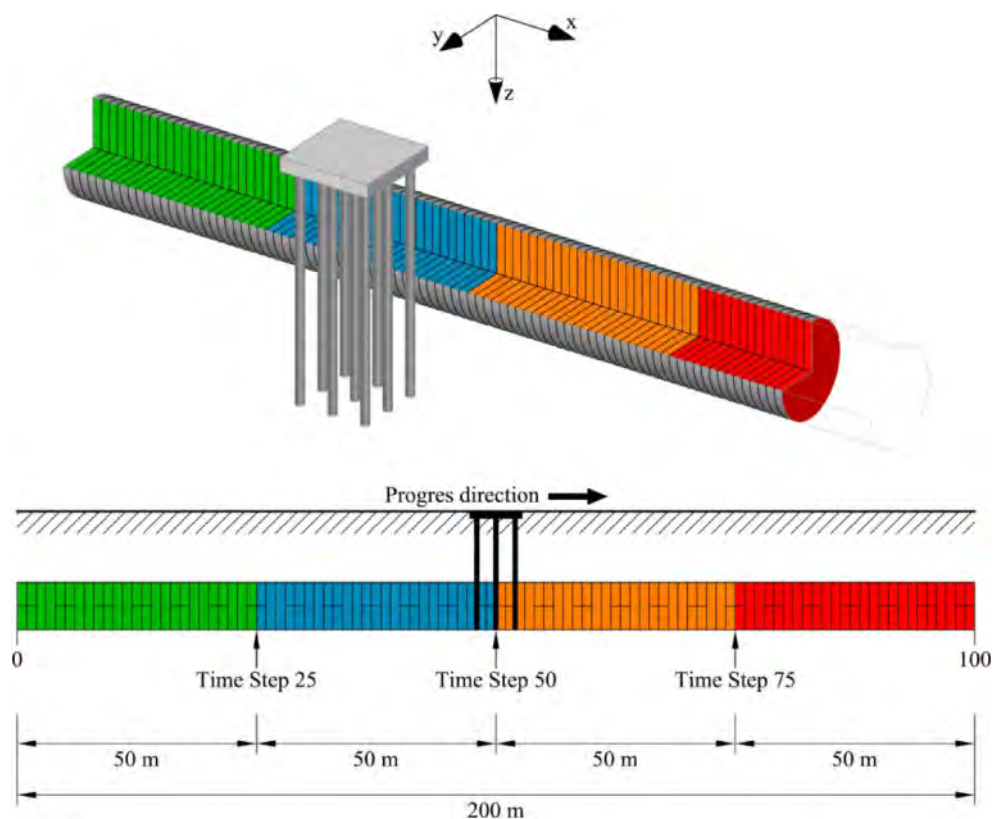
3D view of the pile foundation and the excavated tunnel. The construction of a 200 m long tunnel is divided in 100 increments 2 m long each one of them.
